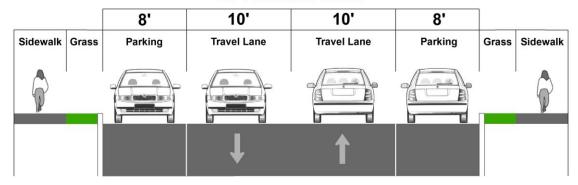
36' Minimum Pavement Width (Low Traffic Volume Streets; Room to Pass 2 Vehicles Required; Parking Both Sides)
